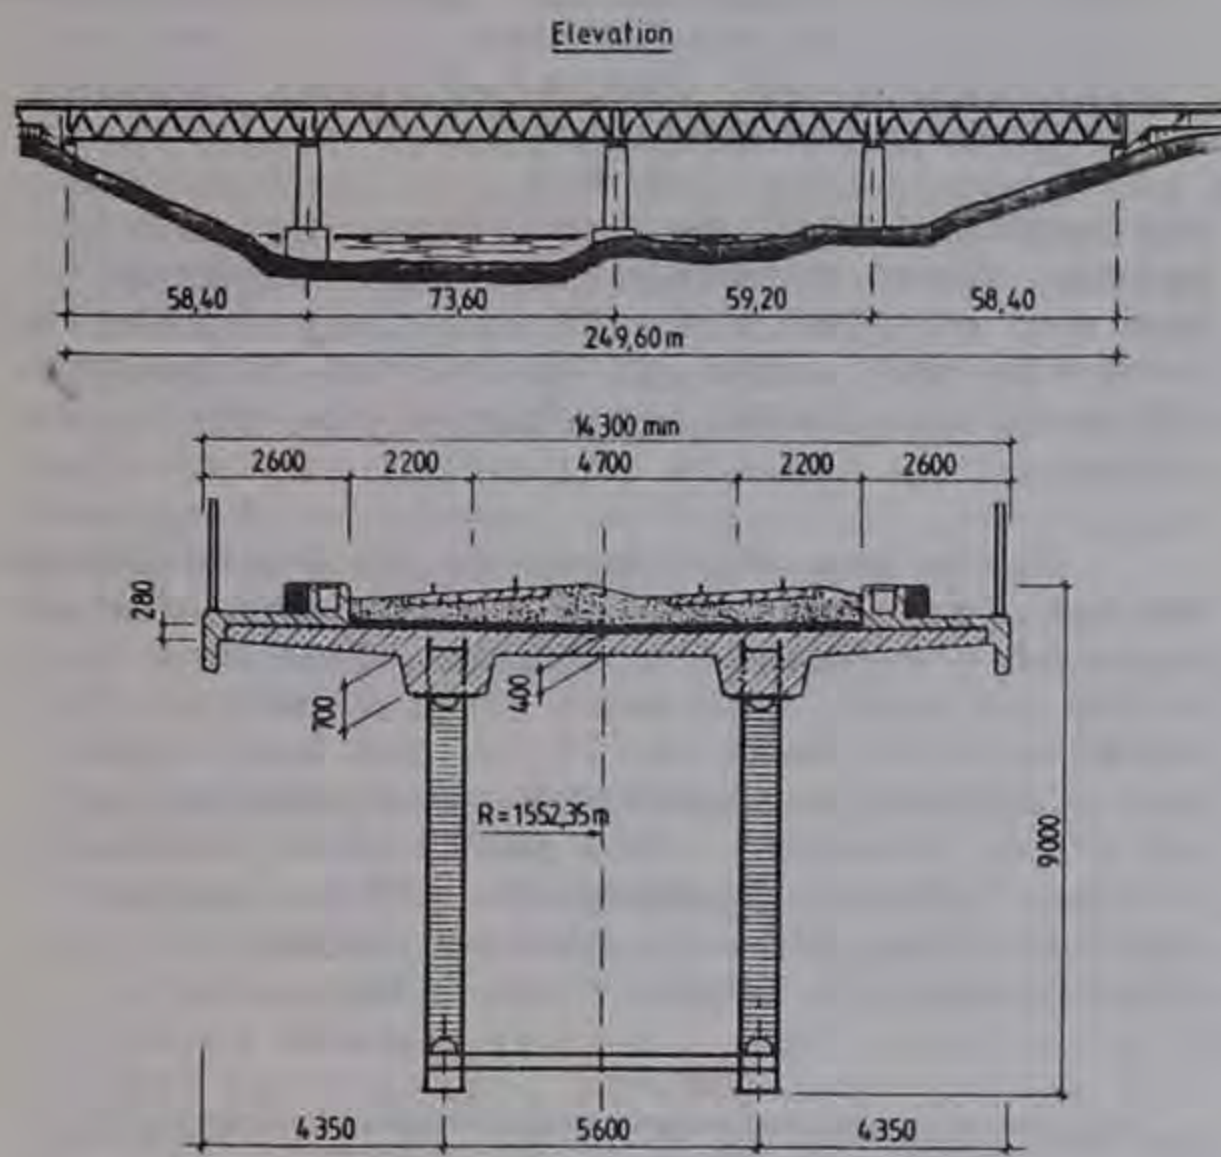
Structural System and Cross-Section of a Composite Truss Bridge(2)
